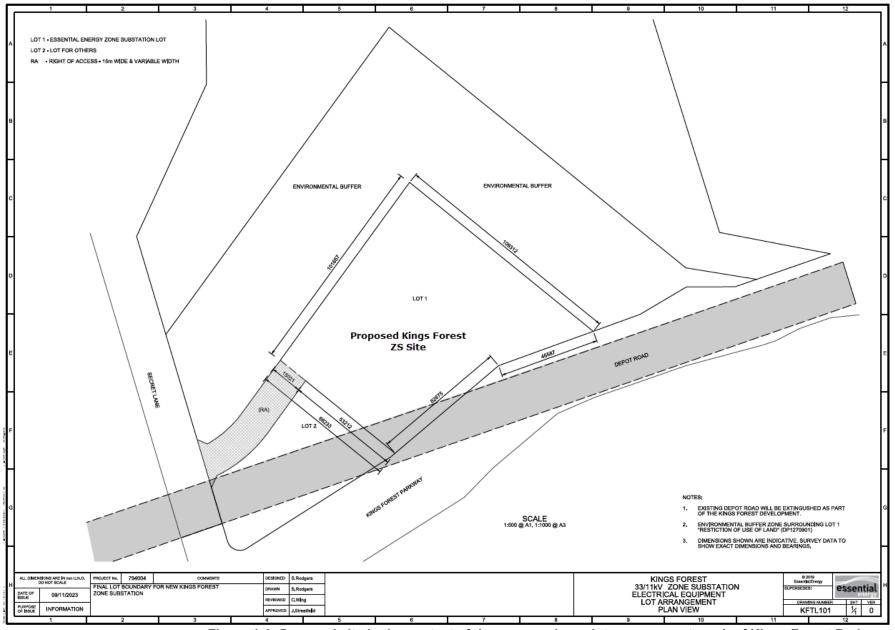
Proposal site in the context of the proposed new lot arrangement north of Kings Forest Parkway
